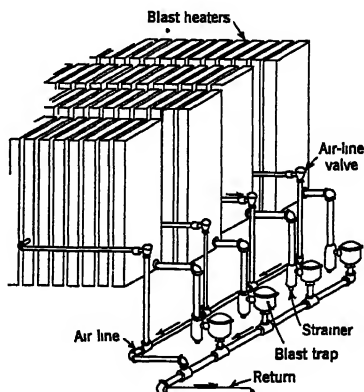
TYPICAL CONNECTIONS TO CENTRAL FAN SYSTEM HEATING UNITS EXCEEDING 12 SECTIONS
